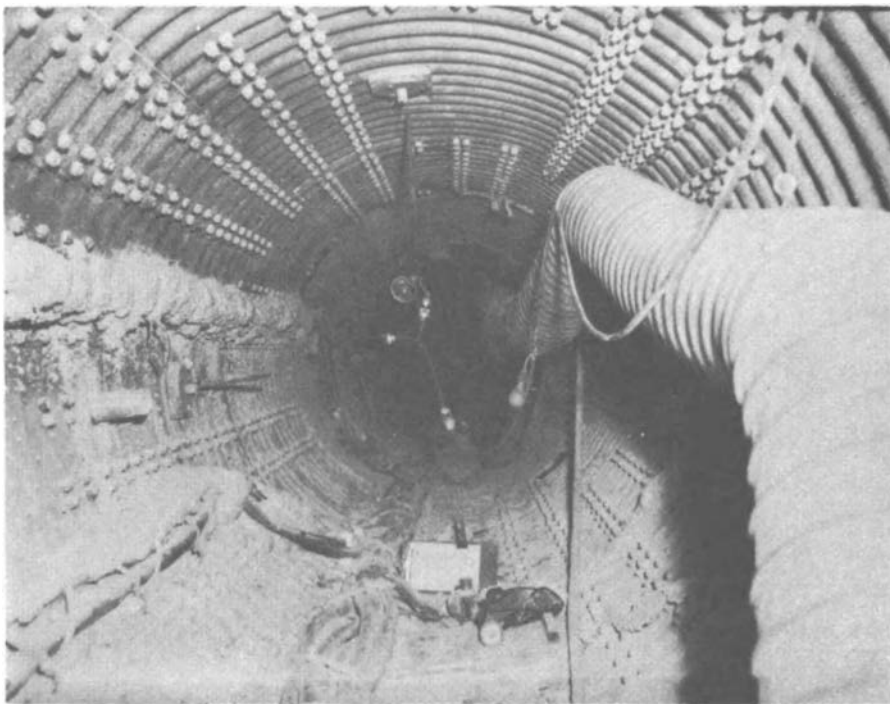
Structure with packing, section BR9 (event Pile Driver).
